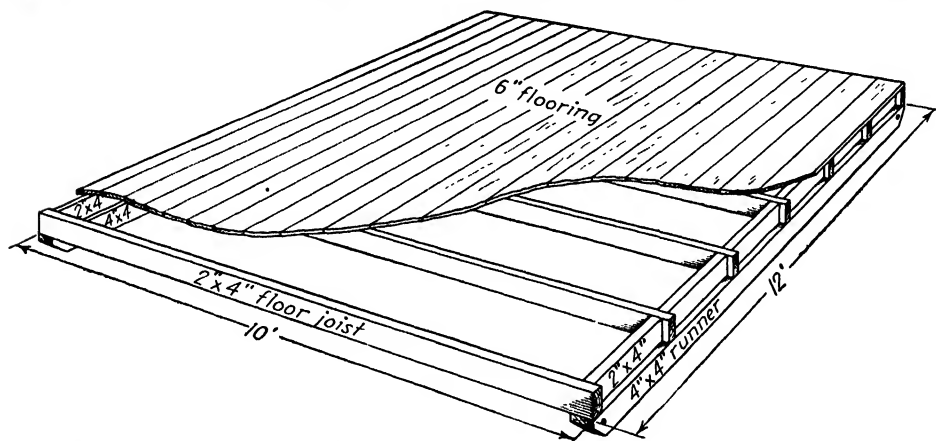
A method of building the floor for a portable brooder or poultry house.
